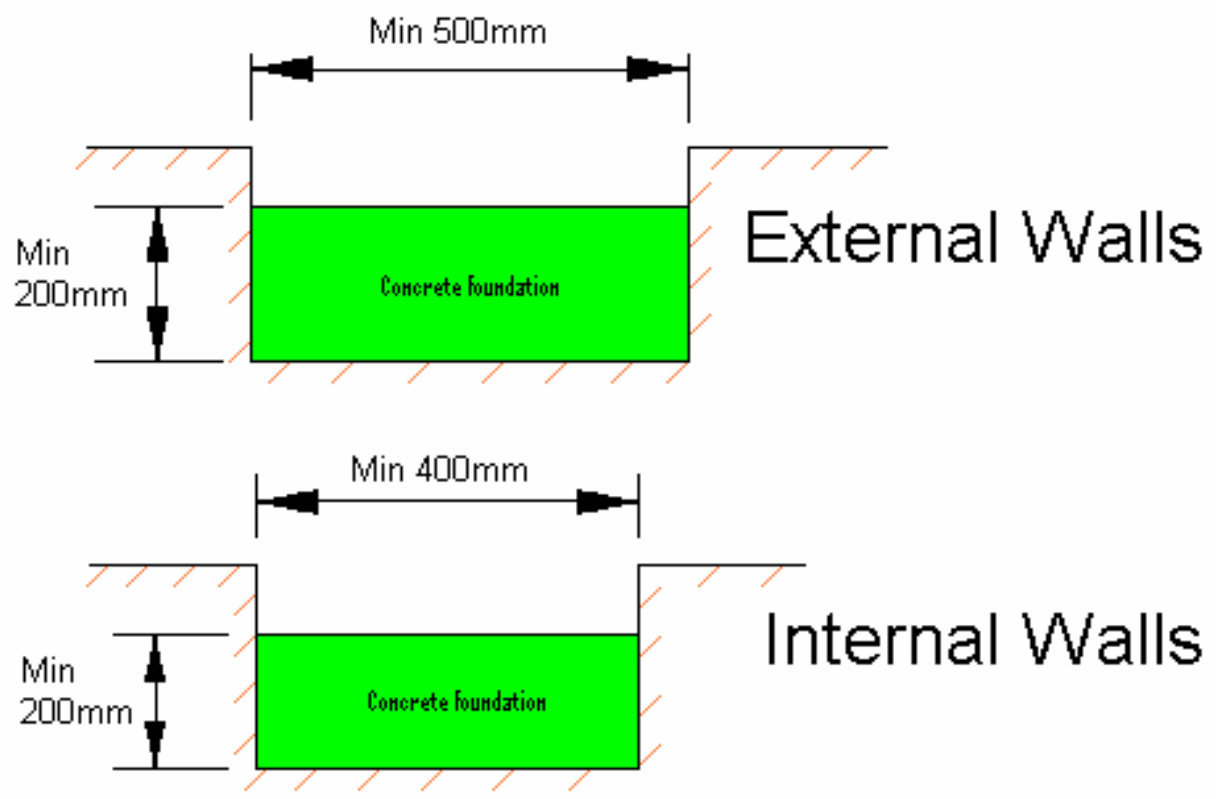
MINIMUM FOUNDATION EXCAVATIONS
